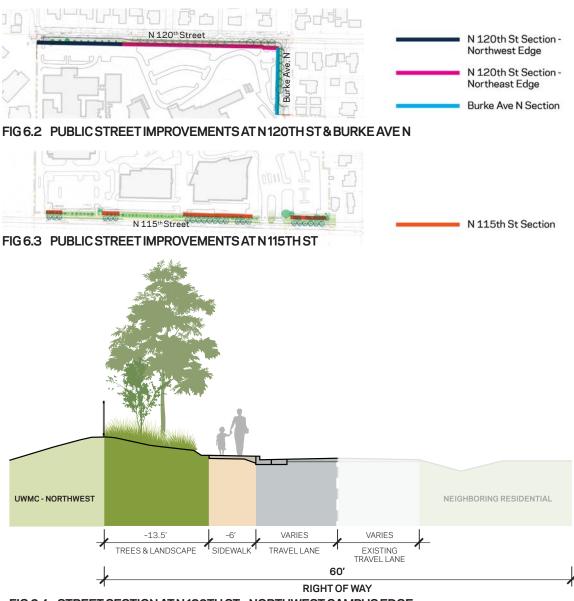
STREET SECTION AT N120TH ST - NORTHWEST CAMPUSEDGE
